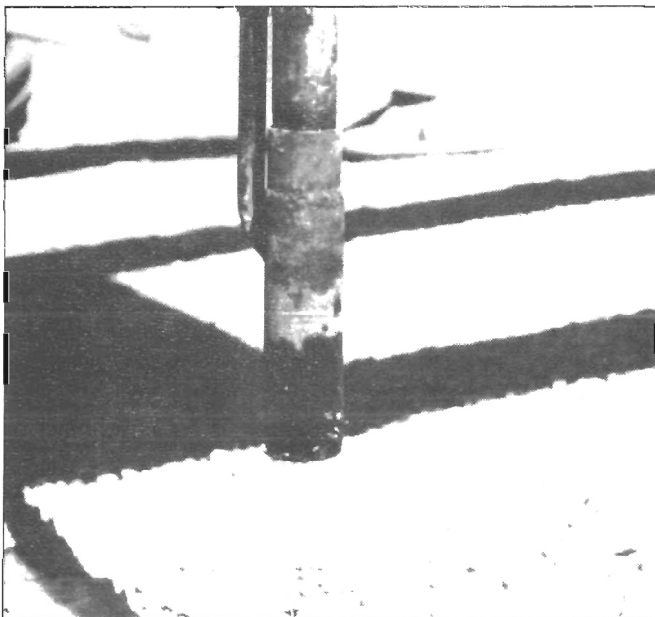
Nozzle used for application of sodium silicate and cementitious grout in column construction.
